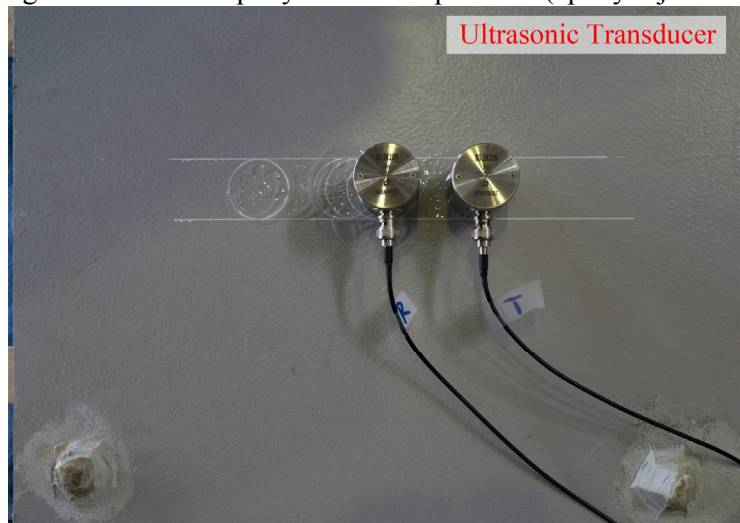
Ultrasonic transducers setting on the specimen.
